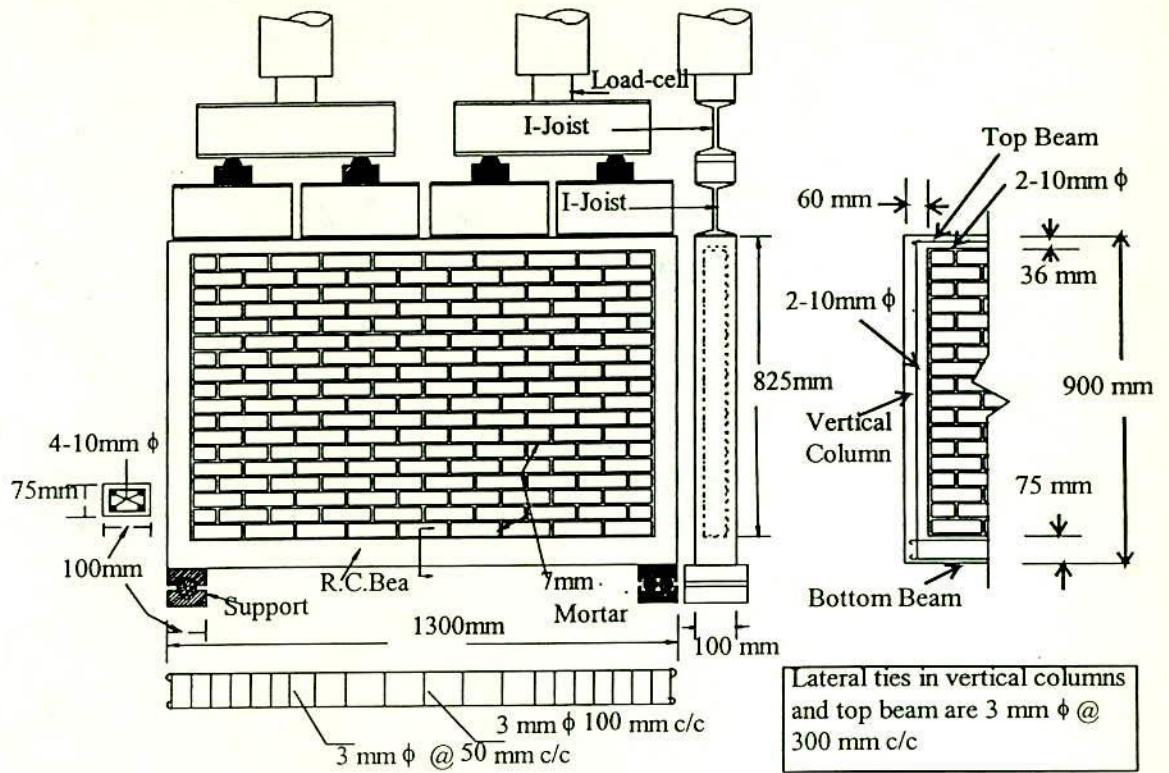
(b) Details of Panel and Testing Arrangement for Wall-beam Confined by Concrete Frame
